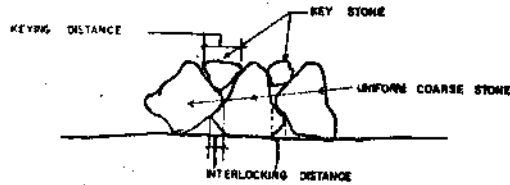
Fig. V Interlocking & Keying of Stone in Penetration Macadam.
